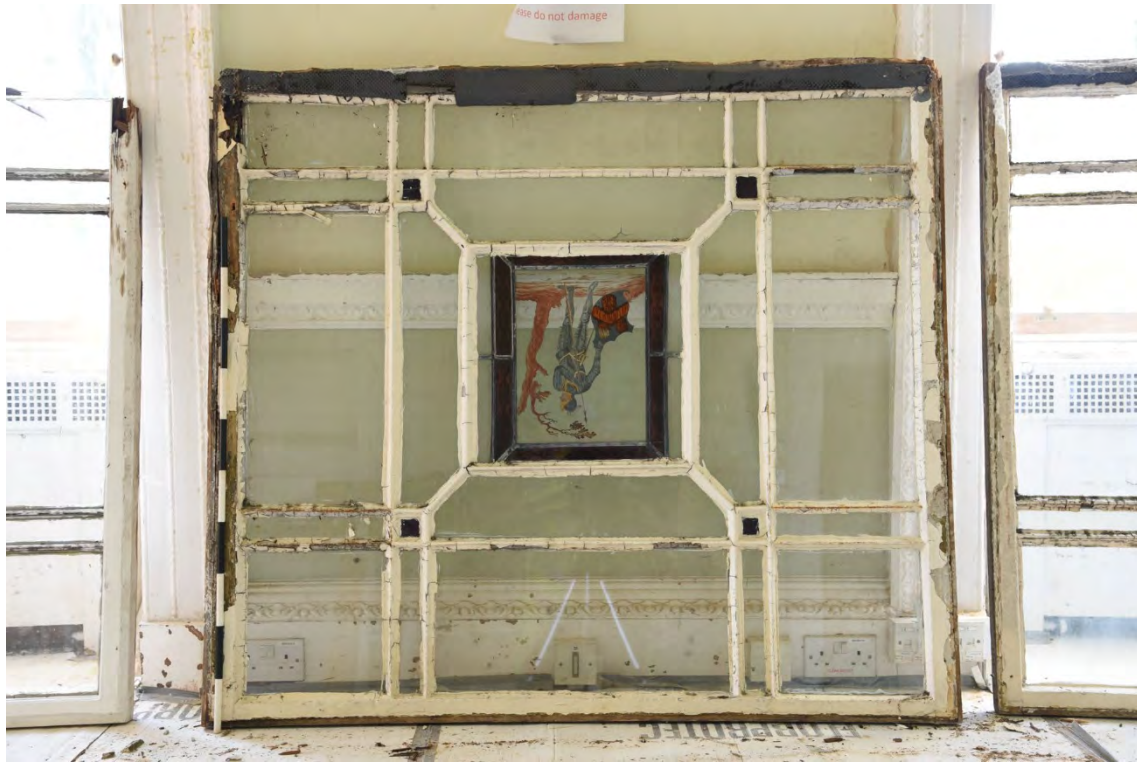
Window panel removed from the lantern's SE elevation, exterior view (BRH183)
